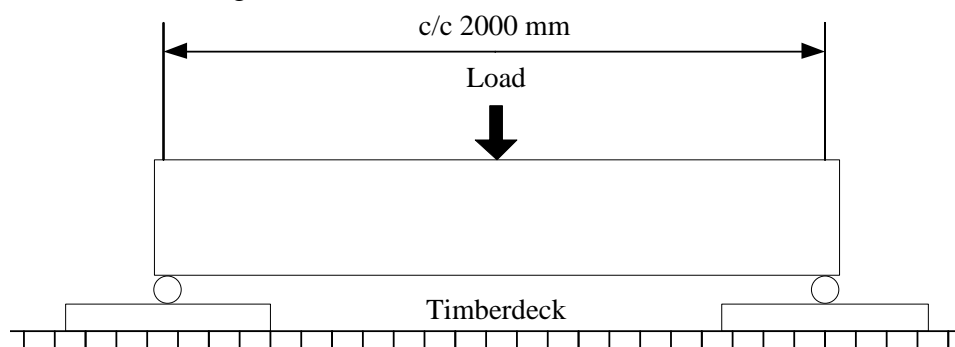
Distributing beam used to load the timber deck in the full-scale test.
